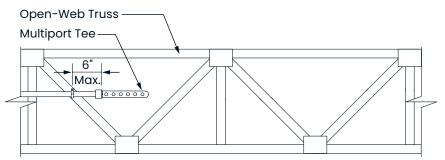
Supporting Multiport Tees on Open-Web Wood Trusses
